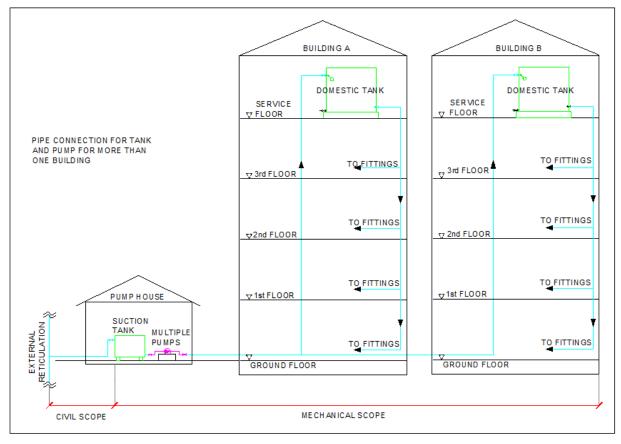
PUMPING TO MULTIPLE BUILDING BLOCKS
